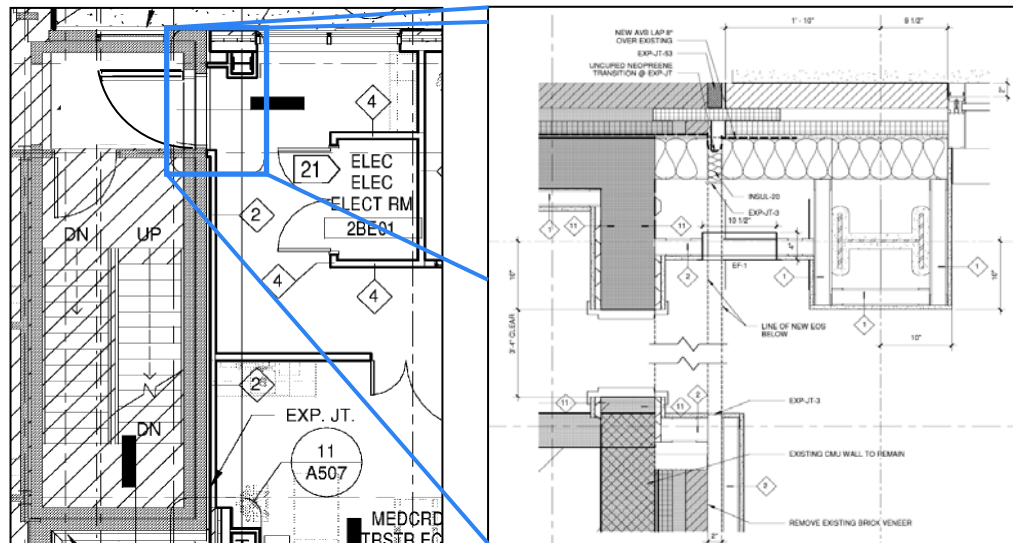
, *Far Left* - Partial image of the second floor connection tying the addition to the existing stairwell. The diagonal hatching represents areas of the existing building not to be affected during construction. *Right* - Detail of the wall penetration which occurs on the second and third floor, as well as a final penetration providing access to the addition's roof. Images courtesy of Ellerbe Becket.
